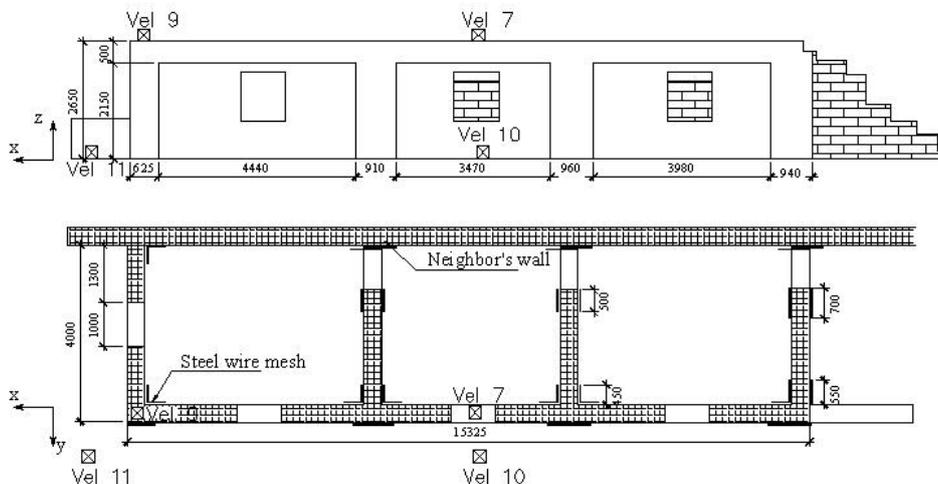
Layout of Guadalupe adobe retrofitted house.
